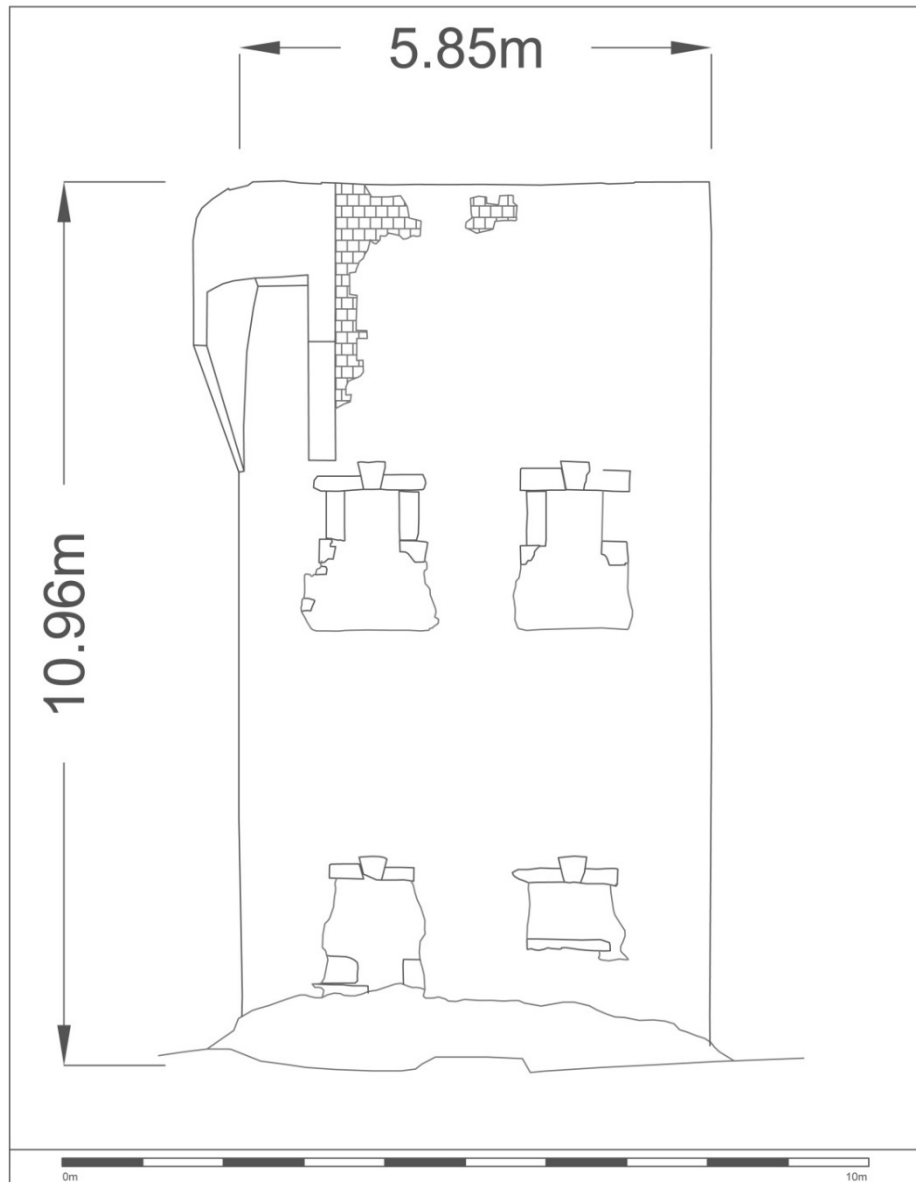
External elevation of the north-west wall of the signal tower at Inisheer Signal Tower.
